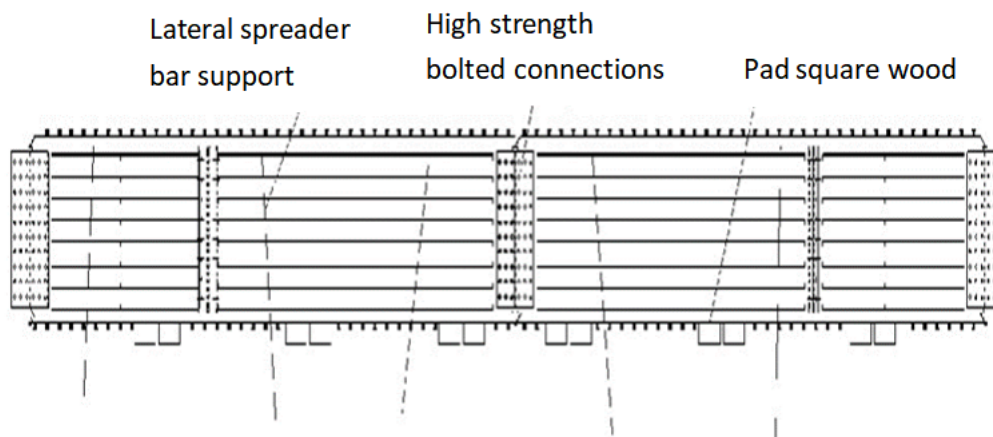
Anchor bolt installation measures bracket platform diagram [8].
